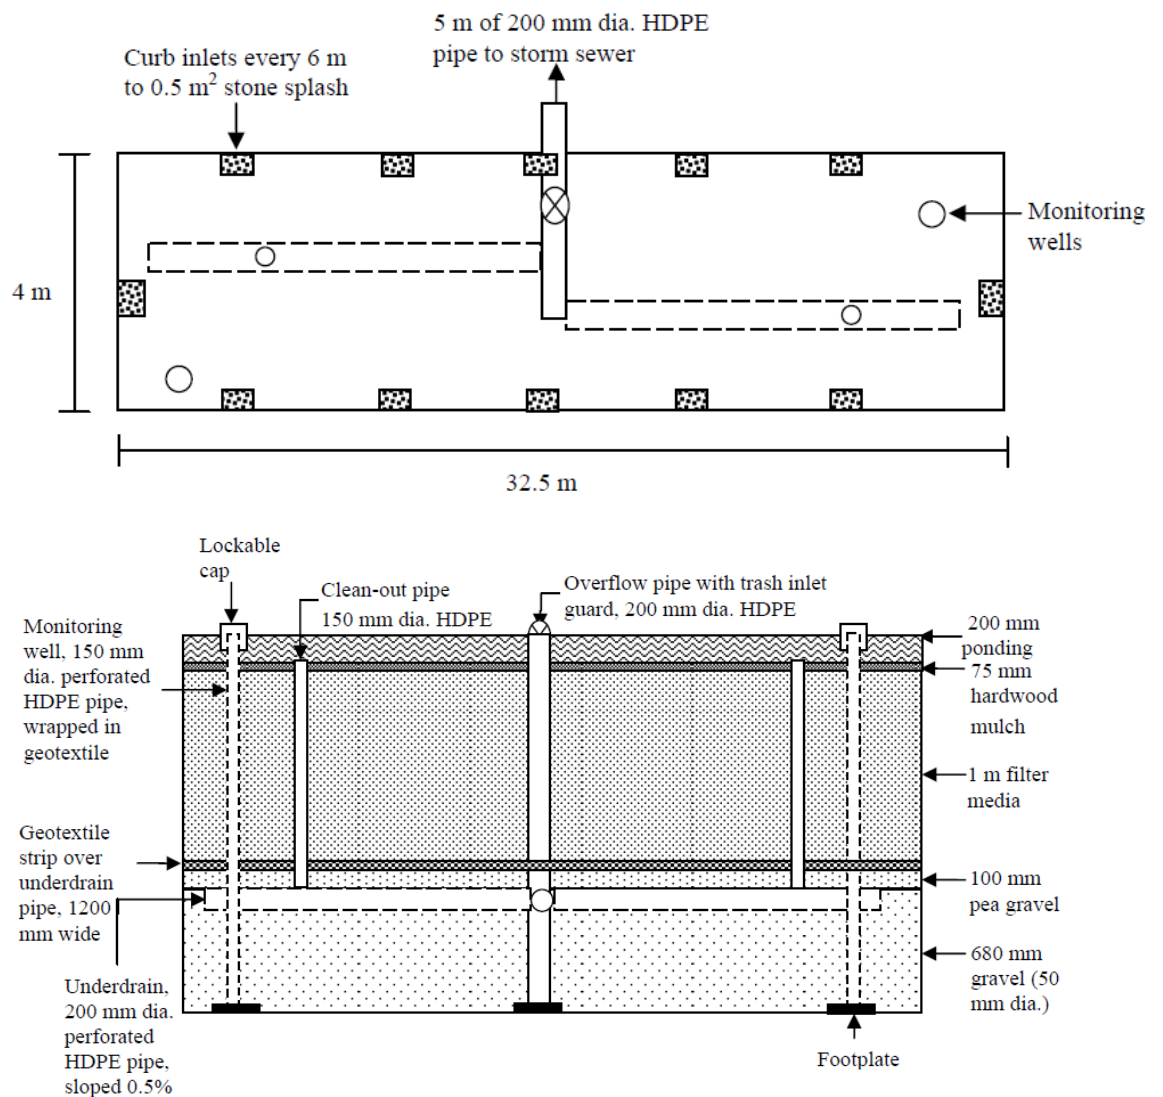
Typical Bio-retention partial infiltration design. Plan view (top); cross section (bottom) (Seters et al., 2013).
